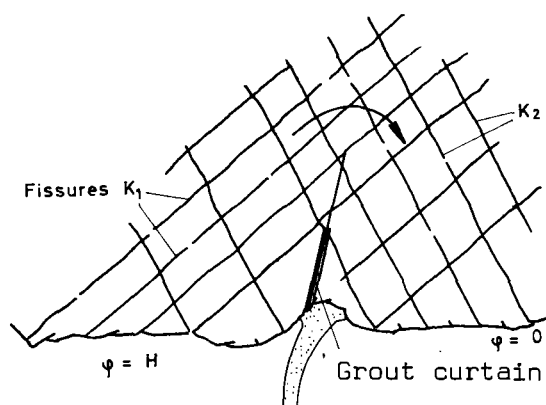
Horizontal cross-section of the abutment of the dam shown in fig. 25
